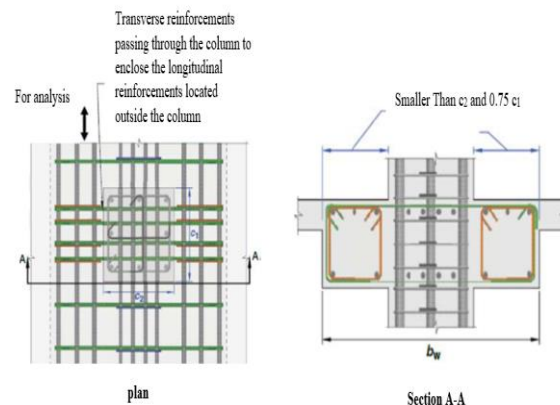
ACI 318-19 Reinforcement Details for Wide Beam to Concrete Column Connections [18].
